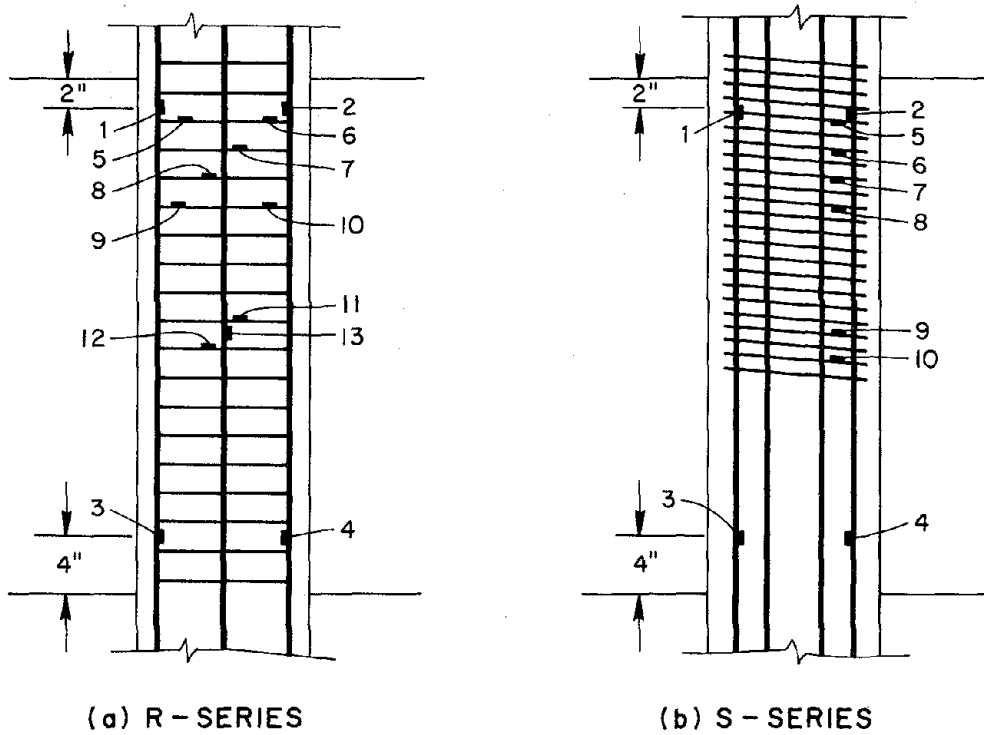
STRAIN GAGE LOCATIONS (1 IN. = 25.4 MM)
